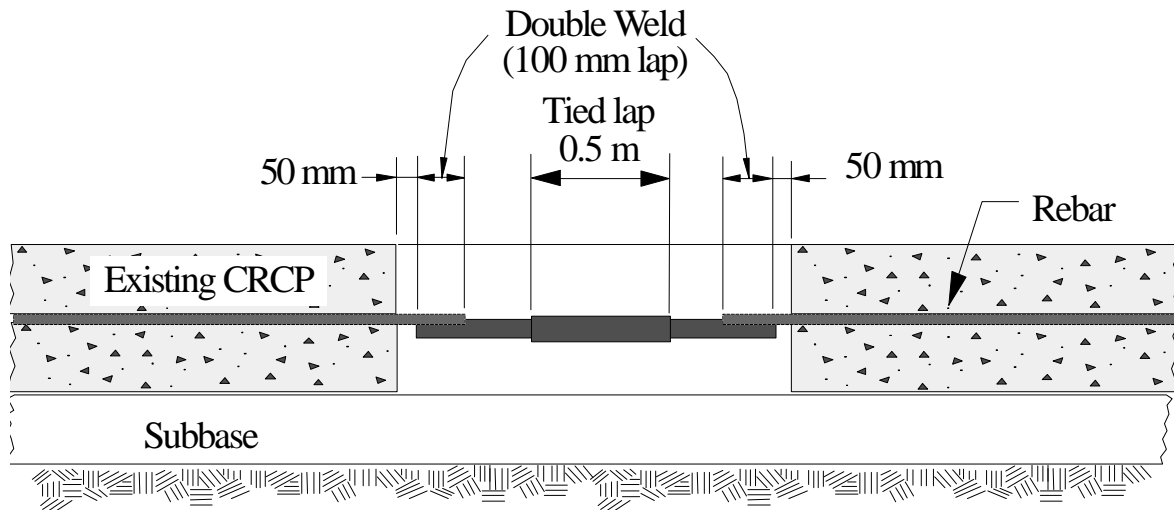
Details of welded or mechanical connection for CRCP repair.⁽⁶⁾
